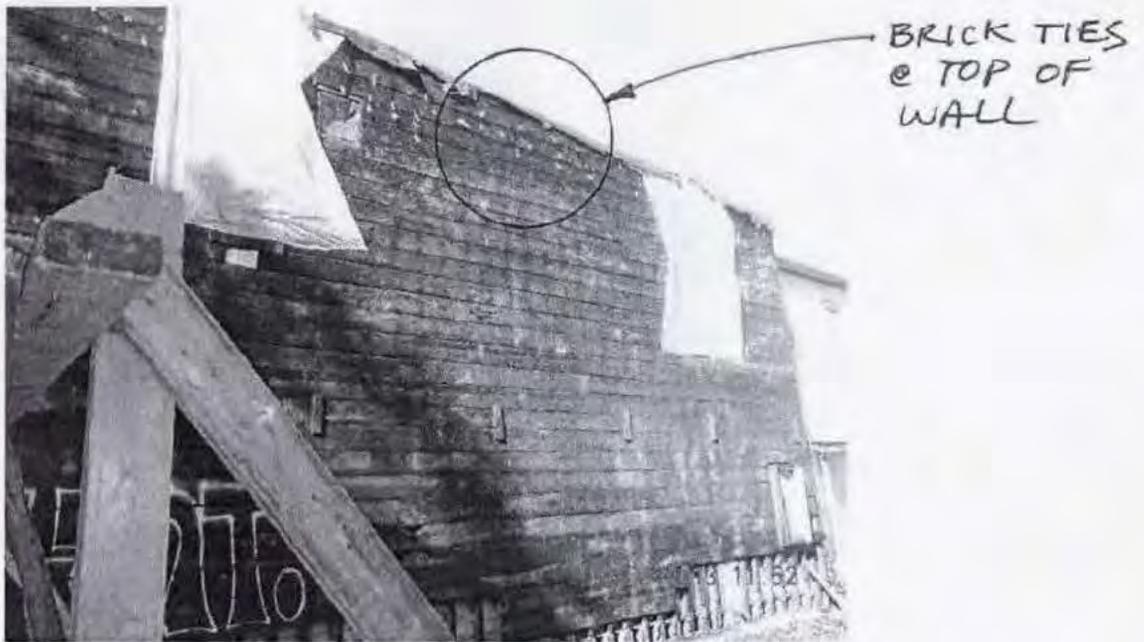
Brick Ties for Anchoring Brick Veneer to East Wall of 439 Powell Street, Vancouver
